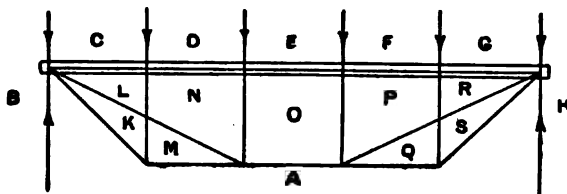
FRAME DIAGRAM FOR FIVE PANEL TRAPEZOIDAL TRUSS.
